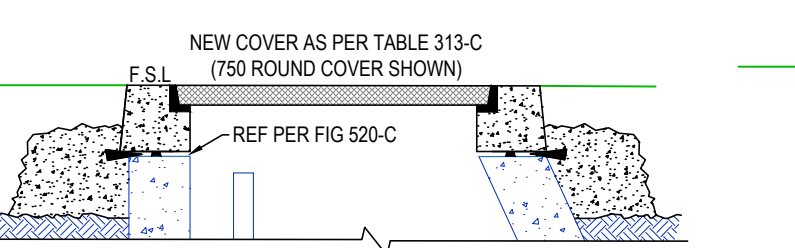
H: TRUNCATED MH CONE & PRECAST FRAME
